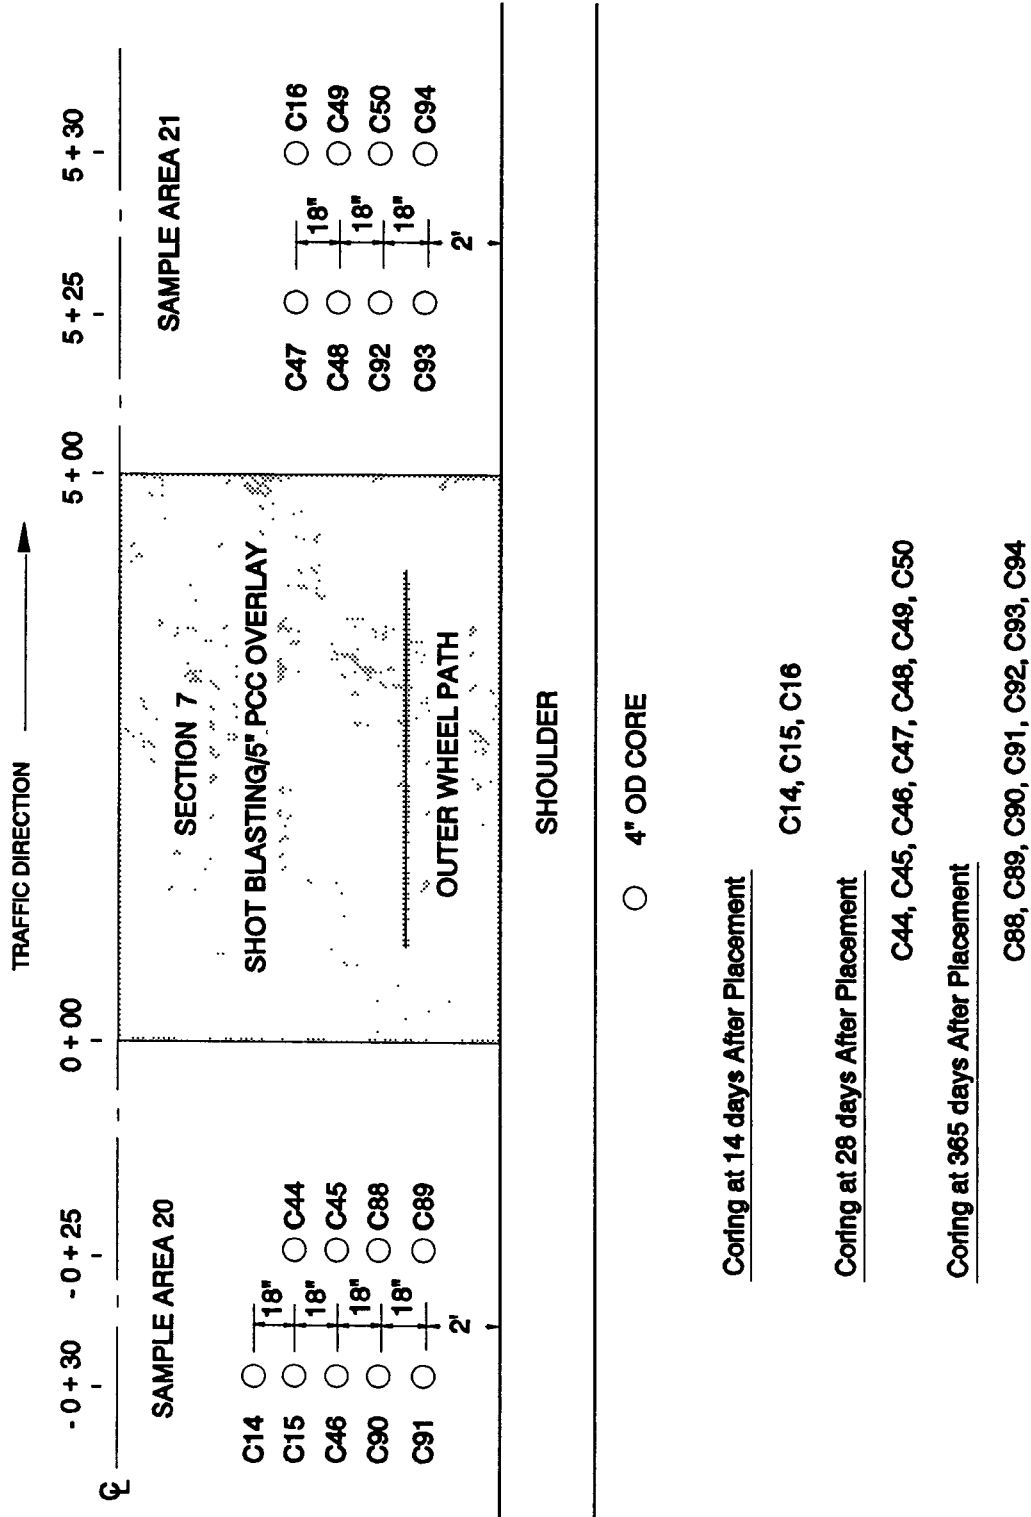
Example of "Post-Construction" Sampling Plan for Test Section 7
